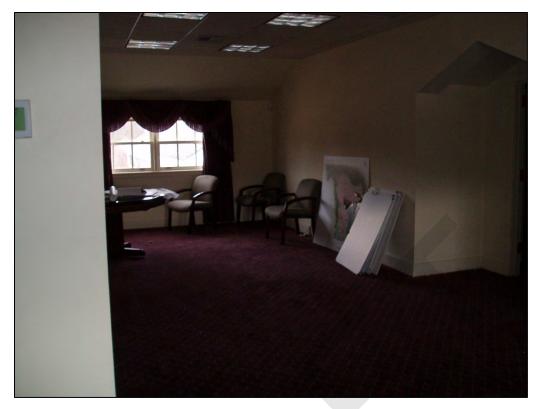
Floor 3-Upper, balcony walkway looking toward Room 19 doorway to left (Field Photograph P1010096, 2/10/2020).
